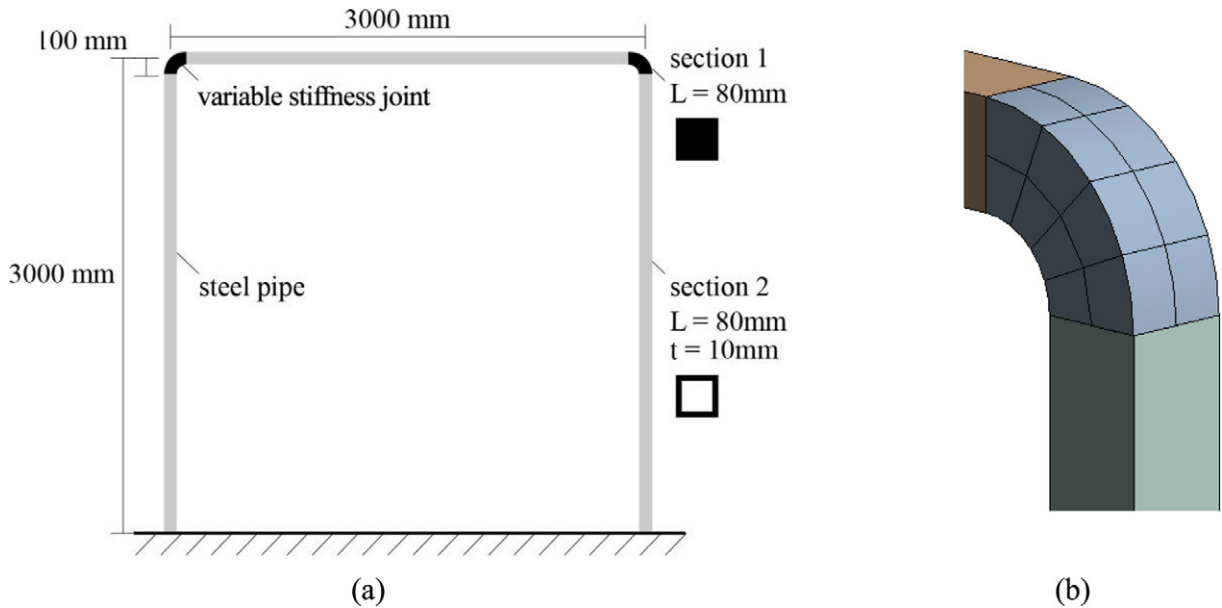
(a) One-story planar frame equipped with two variable stiffness joints; (b) joint mesh.
